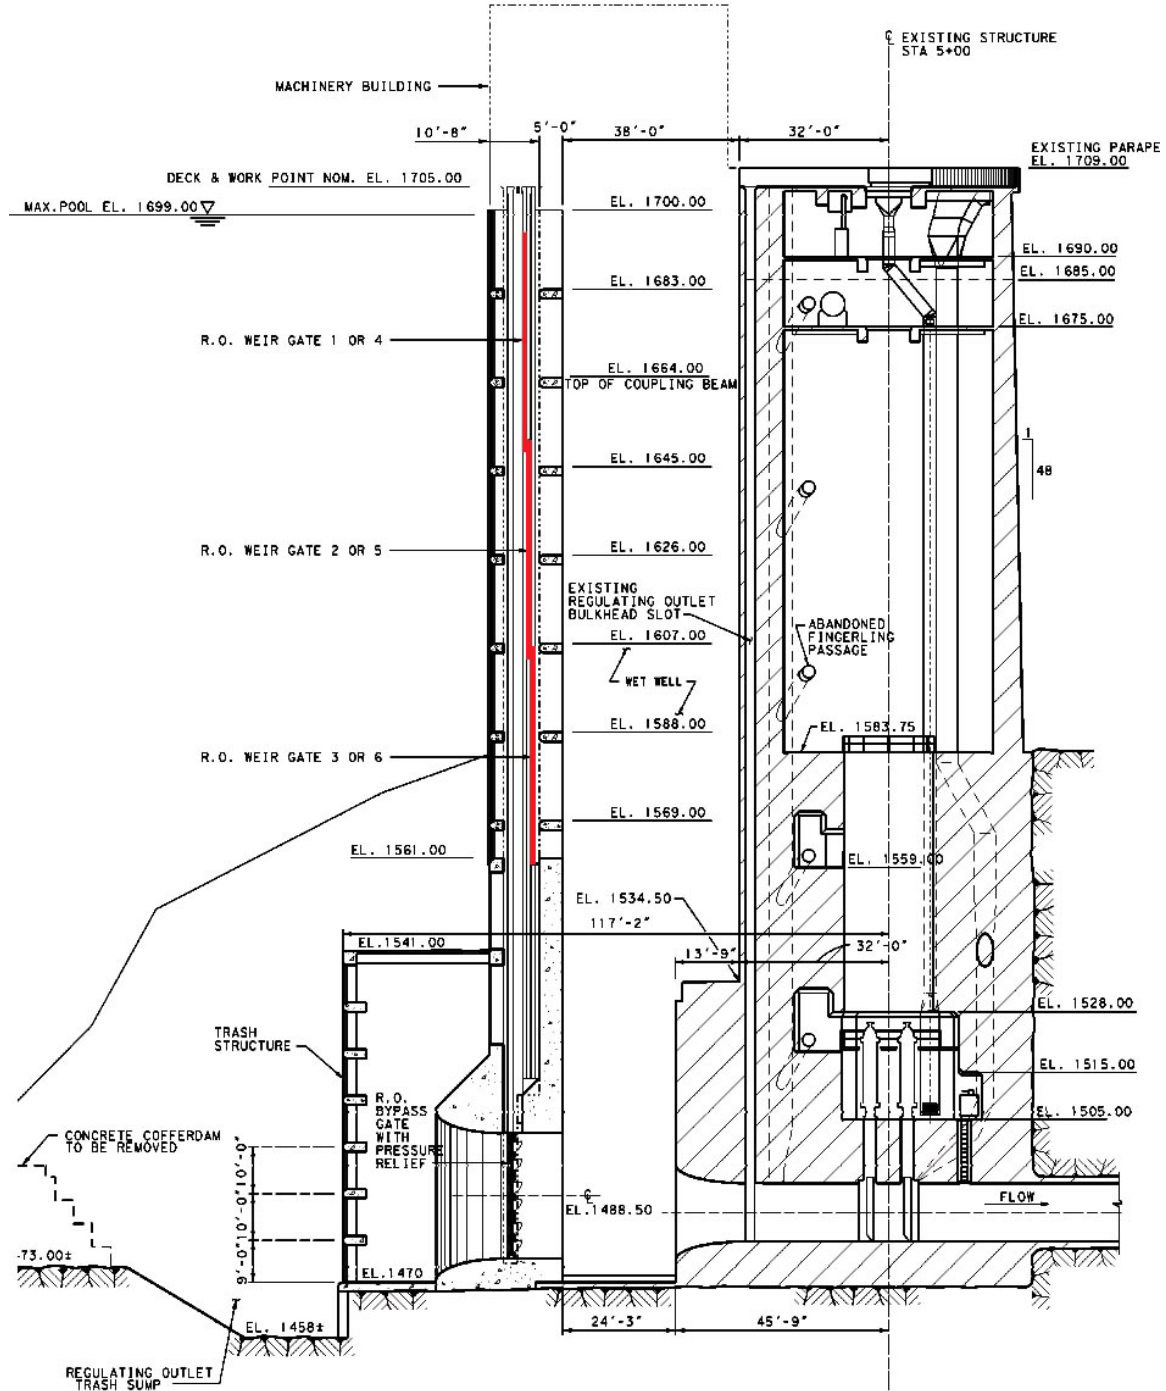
Elevation View of Cougar Dam Water Temperature Tower
